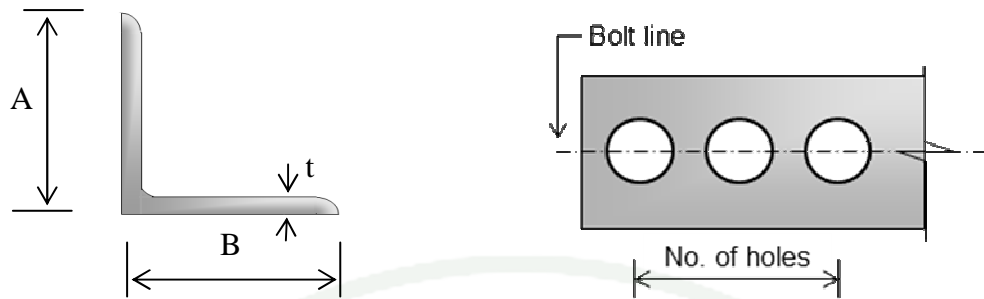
Definition of bolt line, no. of holes and dimension A, B and t.
